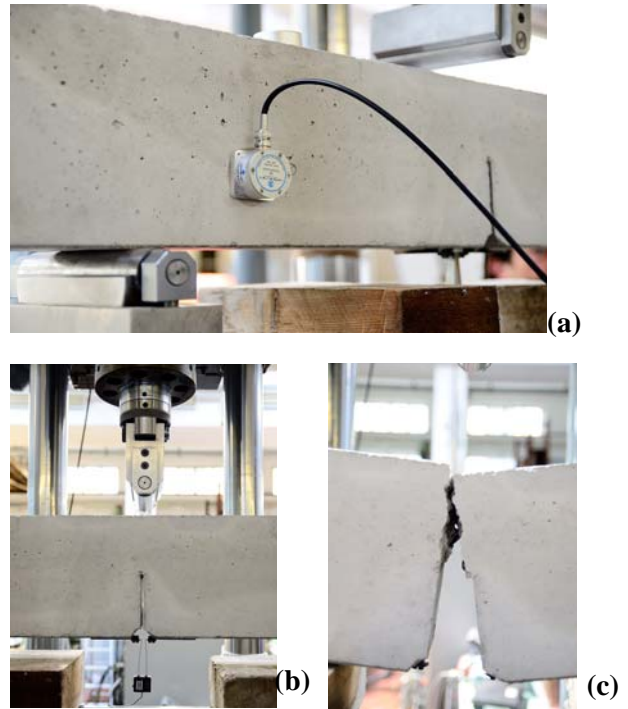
(a) New AE equipment applied to the monitored specimen. (b) Notched beam during the test. (c) Concrete beam after the final failure.
